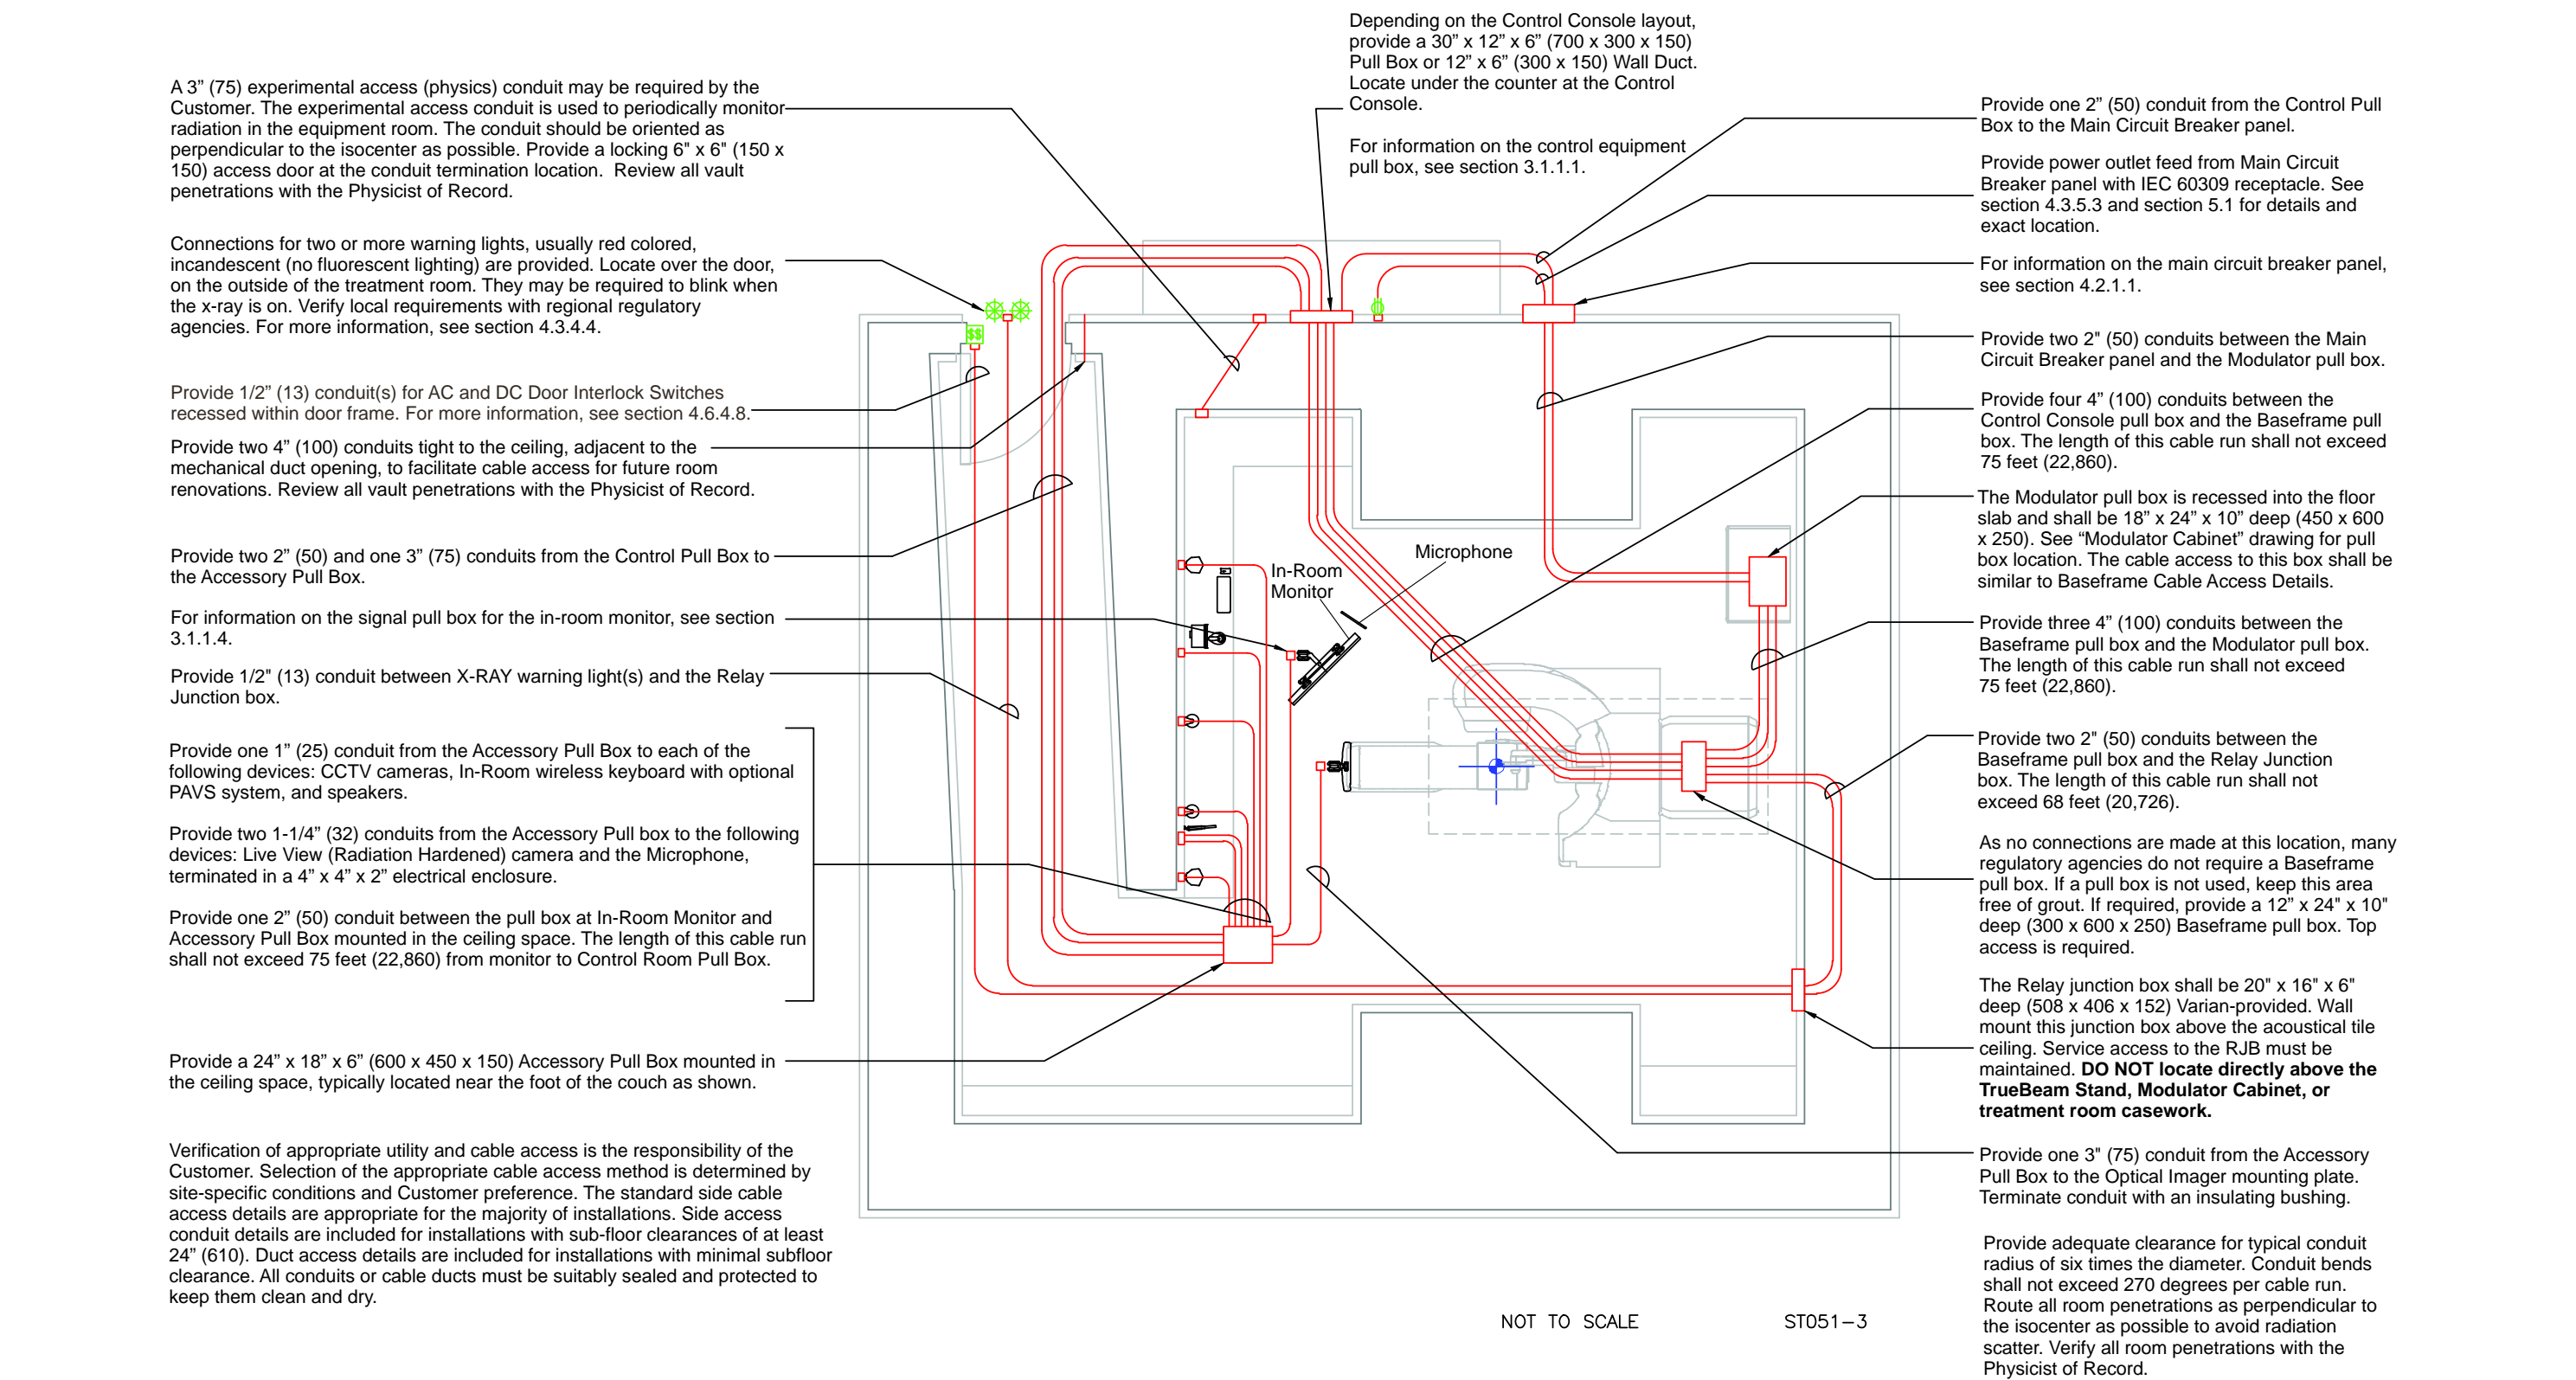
Typical TrueBeam STx Conduit Diagram (Plan View)
